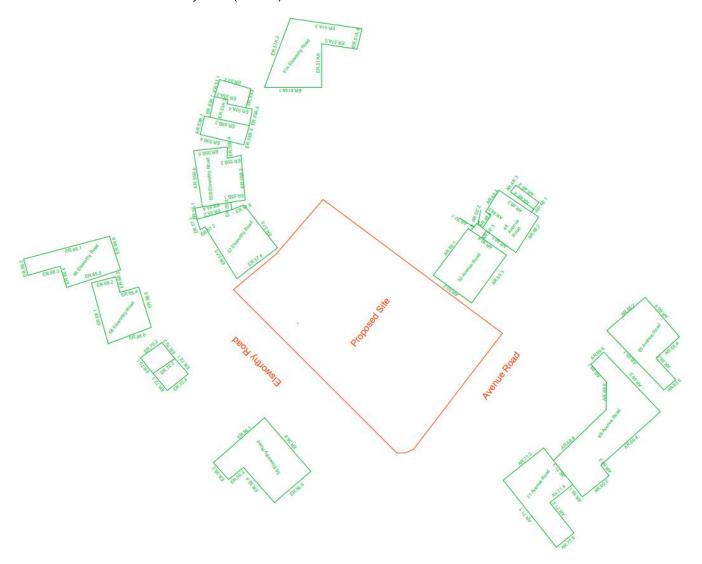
Simplified scheme and nomenclature for each building façade/masonry wall element
